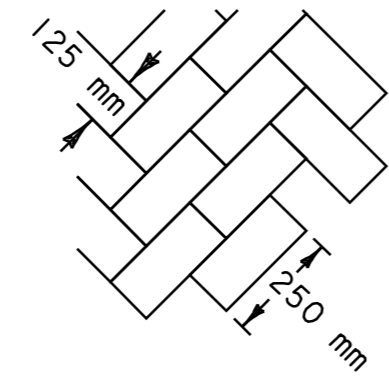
DETAIL OF DURABLE CROSSWALK MARKINGS WITH BRICK TEXTURING
